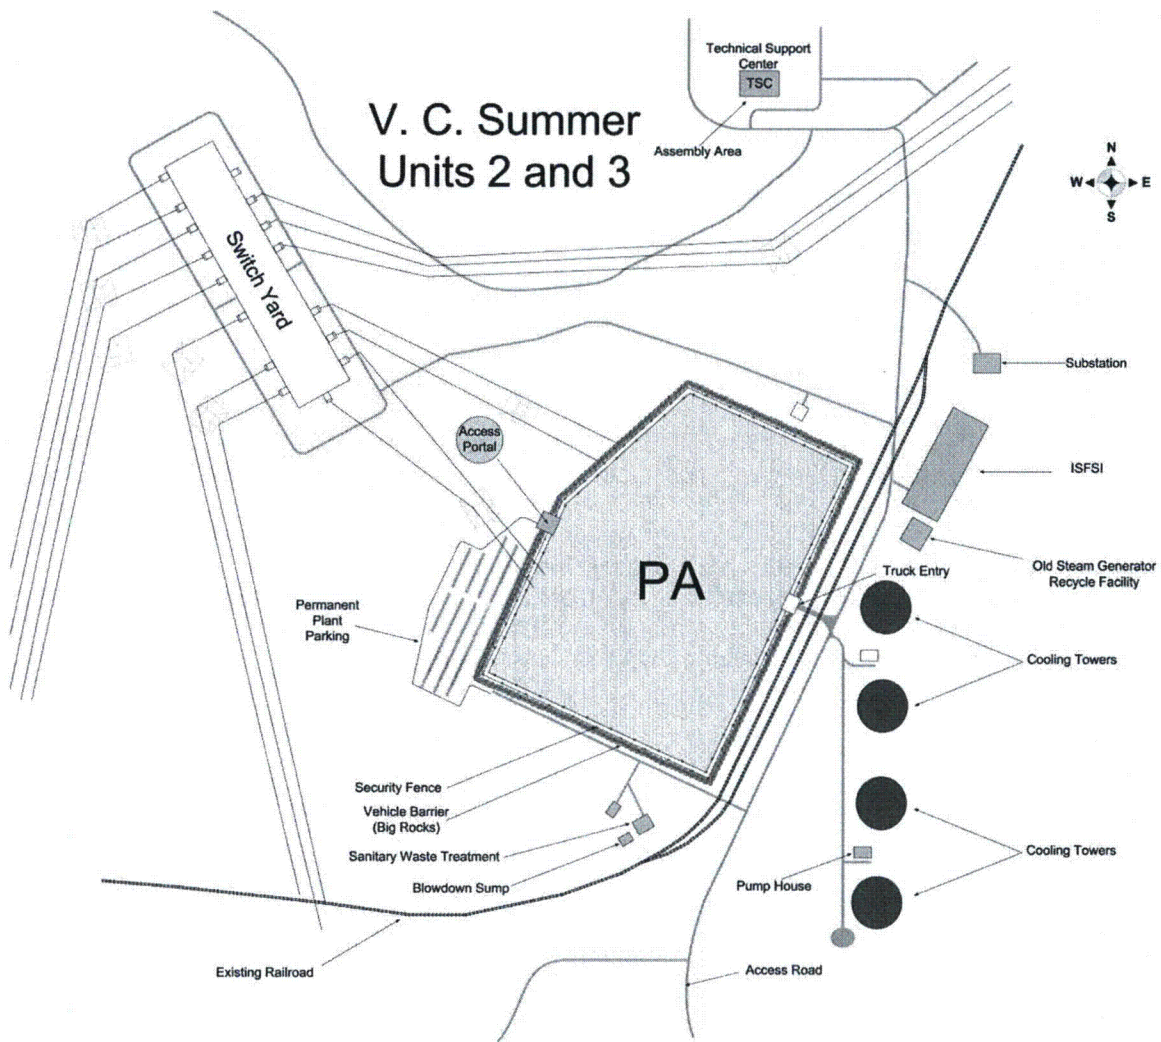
Units 2 and 3 Facility Layout (specimen)
